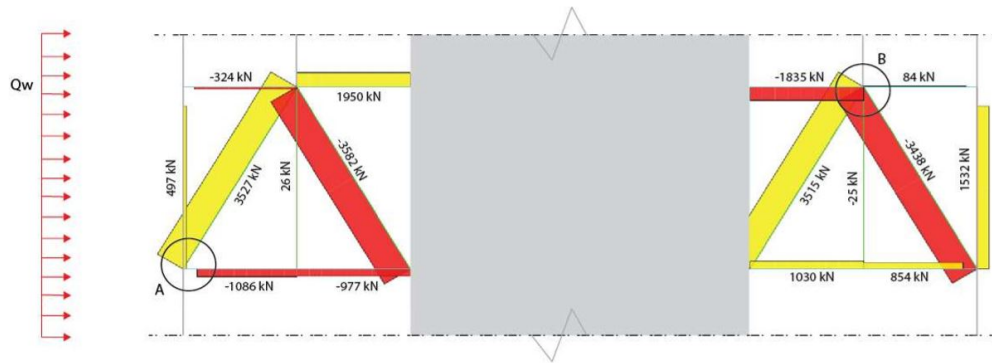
Outrigger truss at storey level 21 with axial forces for SLS wind load case.
